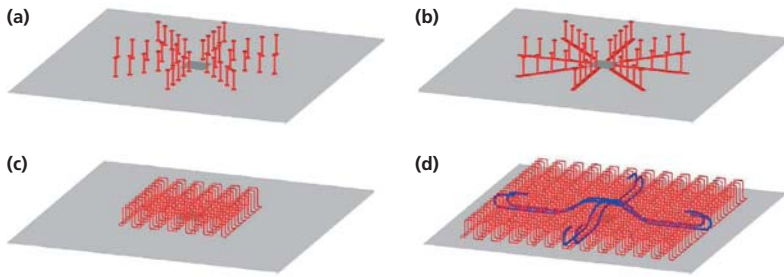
Some examples of punching shear reinforcement: (a) studs; (b) studs welded to steel plates; (c) cages of stirrups; and (d) bent-up bars in combination with cages of stirrups.
